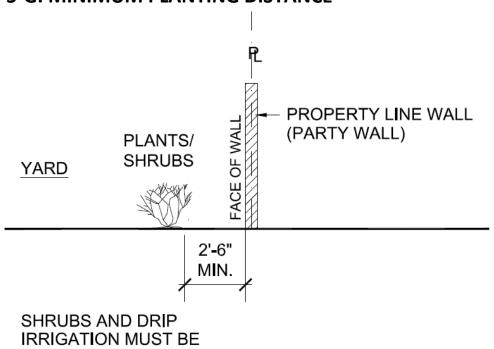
F: MINIMUM PLANTING DISTANCES
